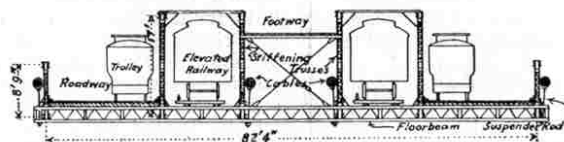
Cross-section of Brooklyn Bridge showing the two roadways, elevated footway, two electric car tracks and two elevated railways
